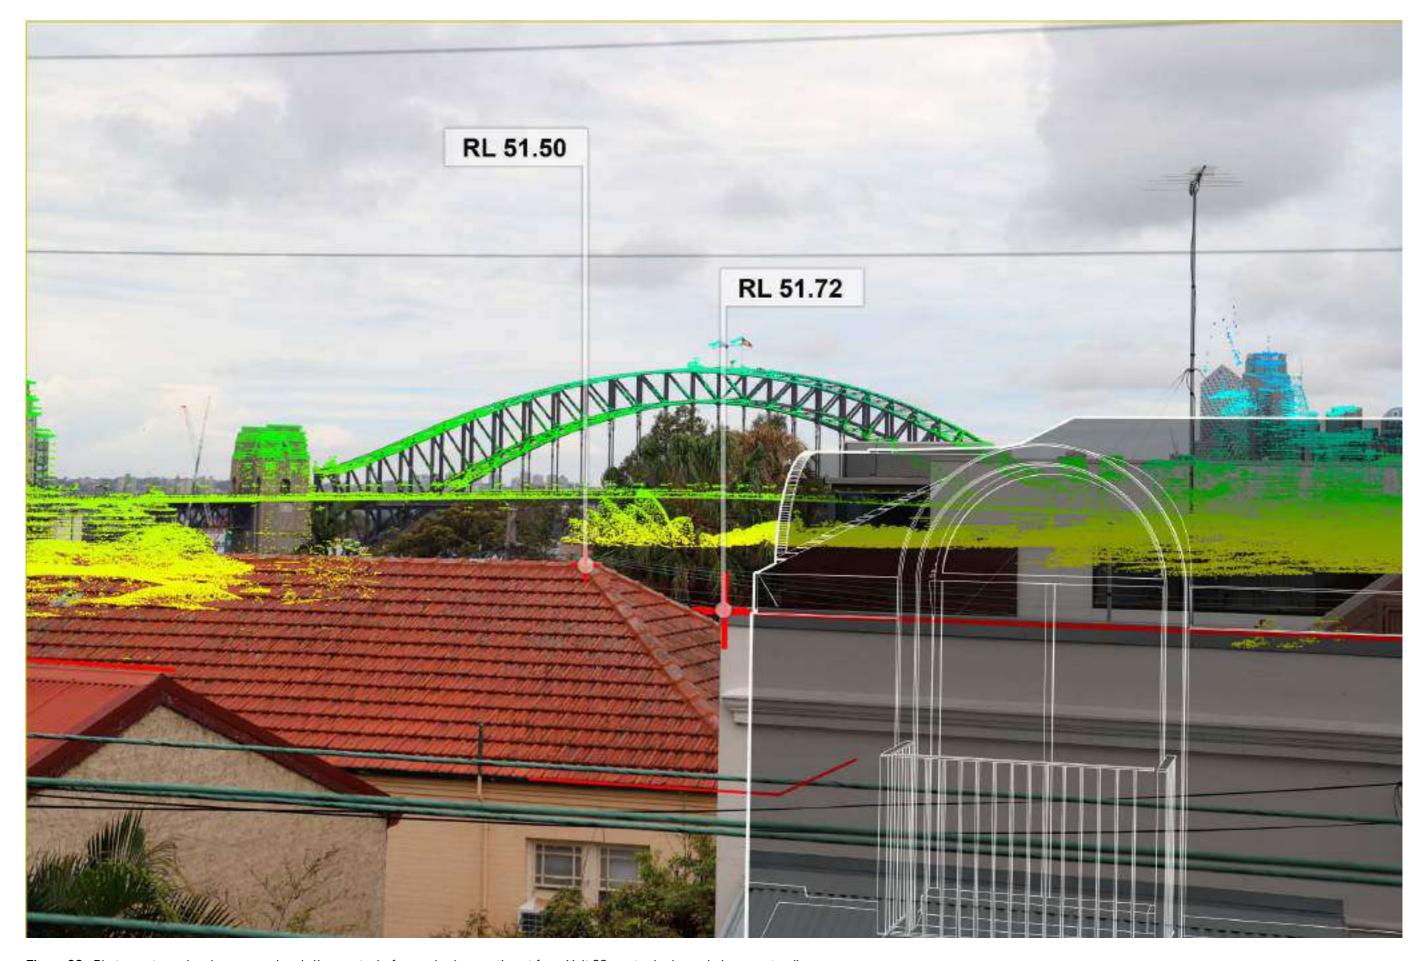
Photomontage showing proposal and alignment wireframes in view southeast from Unit 66 master bedroom balcony – standing
